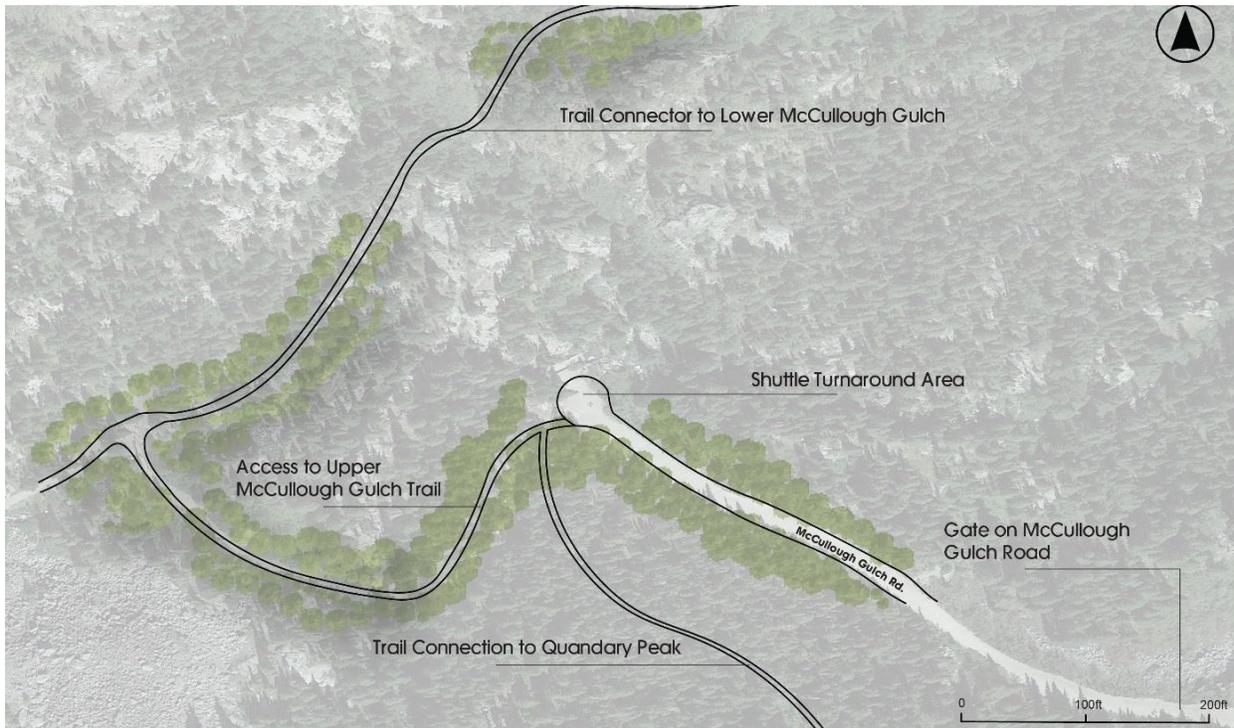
McCullough Gulch Trailhead Access Plan Concept (Trailhead)
